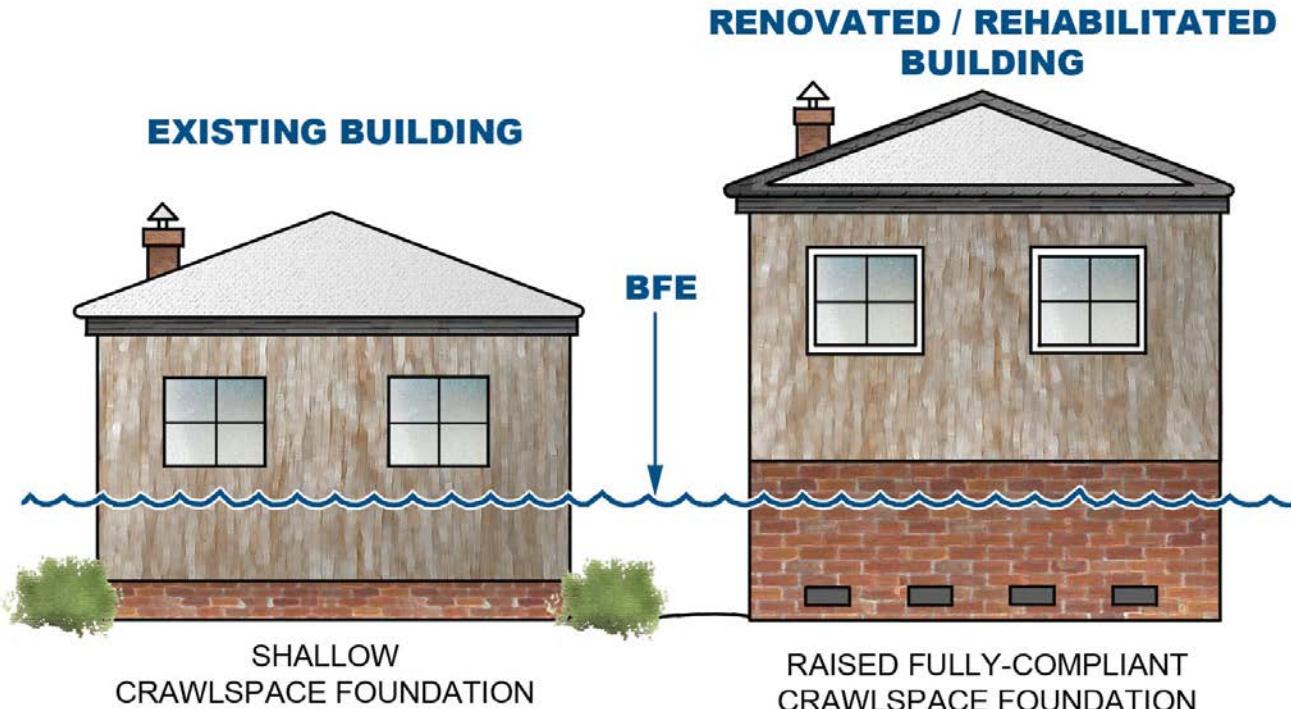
Substantially Improvement- Reconstruction on Existing Foundation
